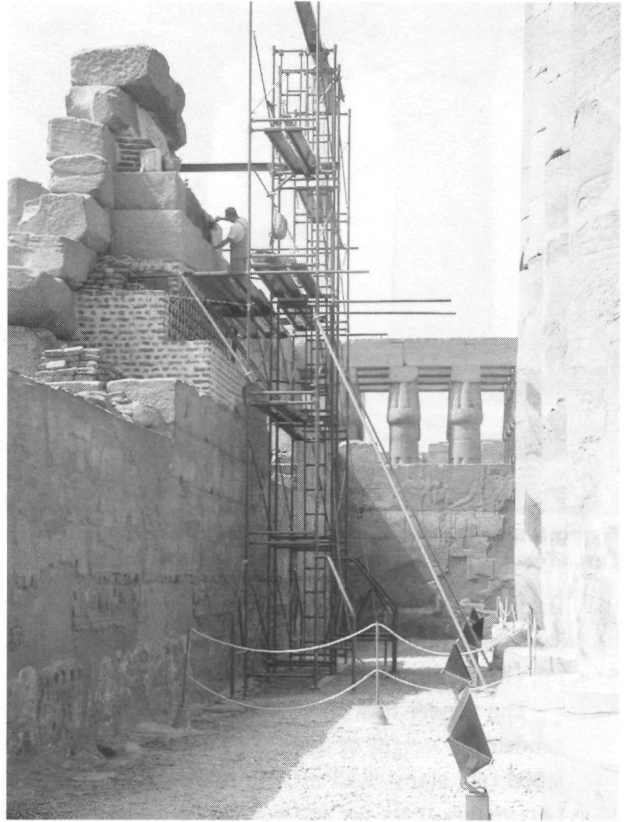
Brick buttress built against projecting eastern wall section of the Colonnade Hall, Luxor Temple, view from the north; Dany Roy. Photo by Ray Johnson
